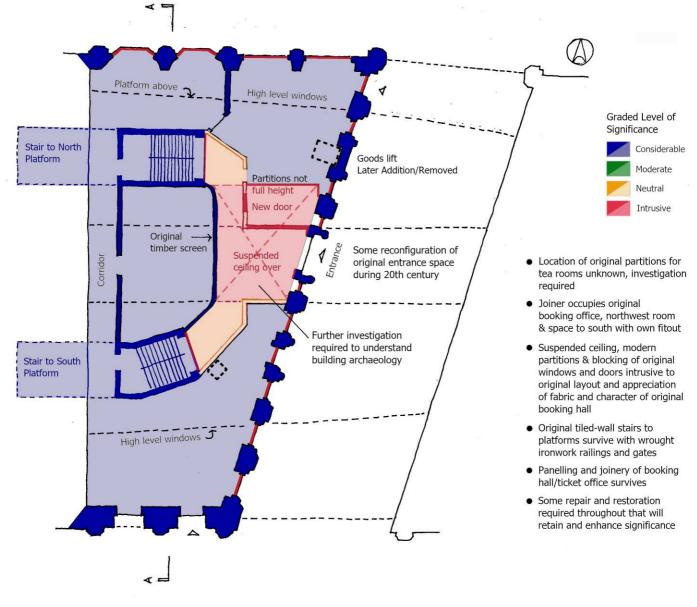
Ground floor booking hall level from Church Street. *Not to scale
